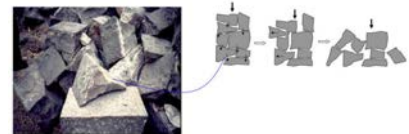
3. Wedge-shaped semi-dressed stones for wall construction with sketch indicating likely failure mechanism. Note: This wedge shape is shown as part of a two wythe wall, but use of wedges in infill is a different behaviour so long as they are not wedged with the large dimension towards the face of the wall.
